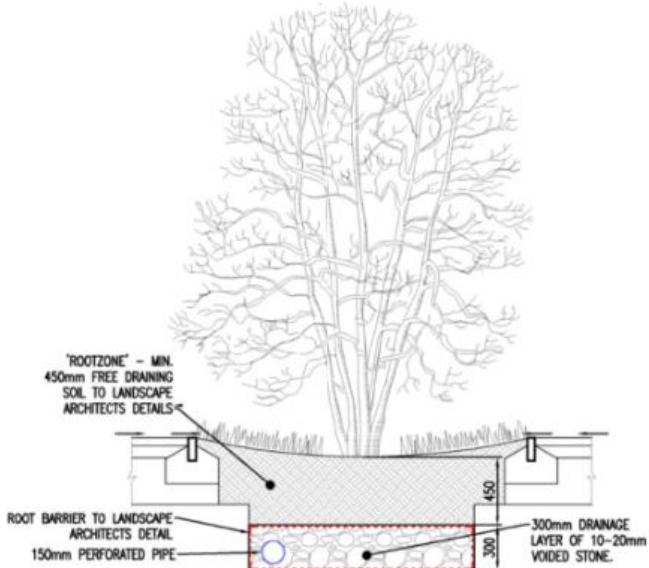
Typical Raingarden/Bioretention Tree Pit Arrangement
